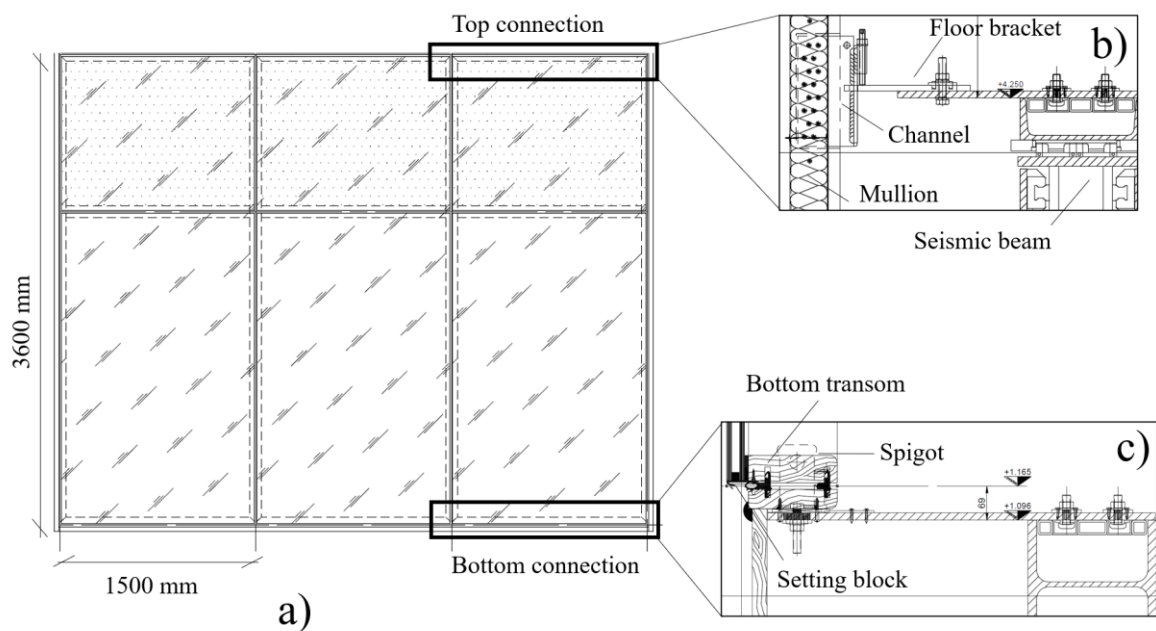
Experimental setup and connections: (a) façade mock-up tested at the laboratory of Permasteelisa Group; construction details for the upper (b) and bottom (c) connection systems.
